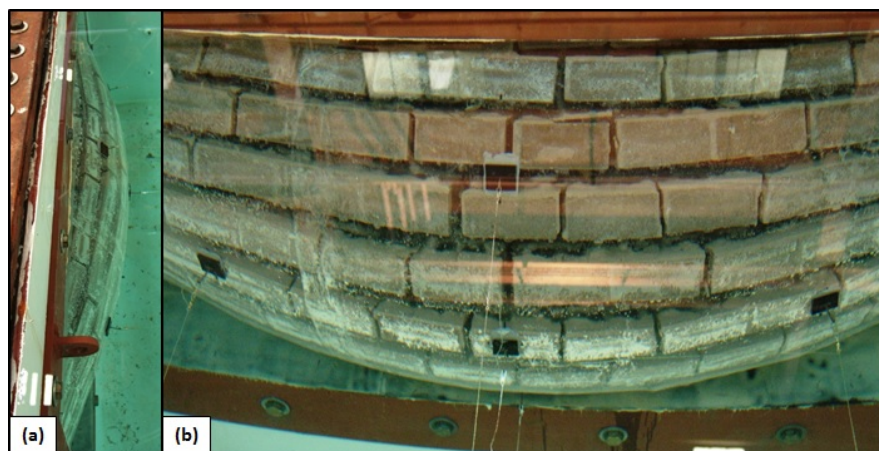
SW19. (a) Deformation exceeded beyond plane of steel frame. (b) Failure of horizontal and vertical mortar joints at large deformation.
